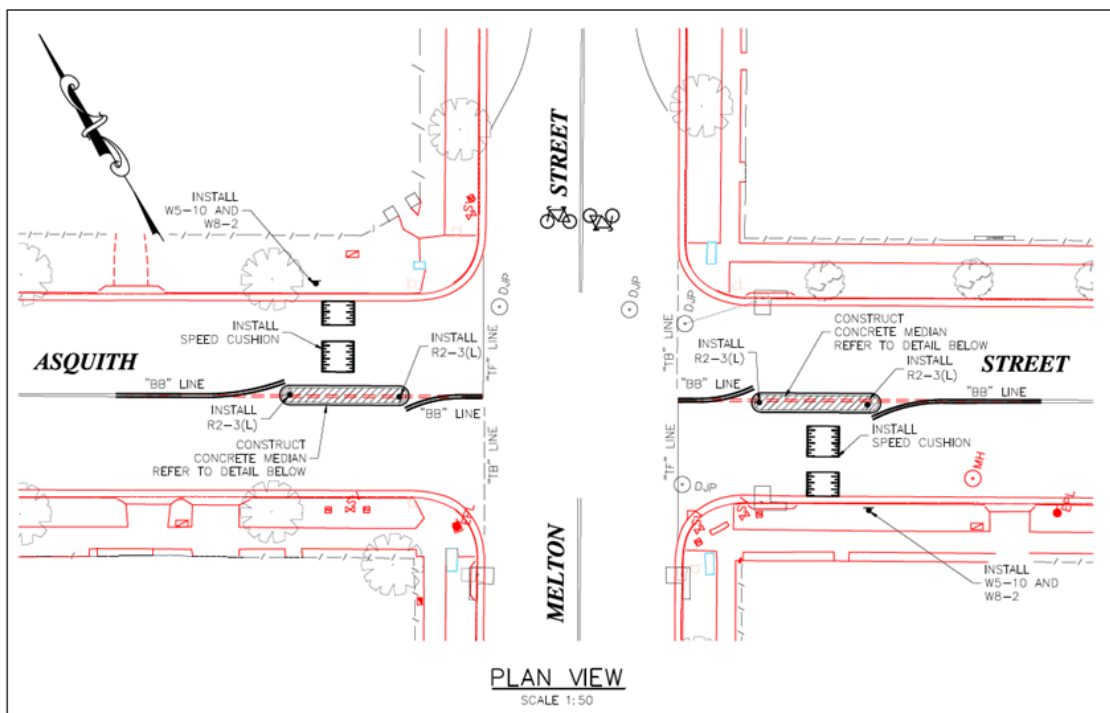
Design plan for the intersection of Asquith Street and Melton Street North, Silverwater
